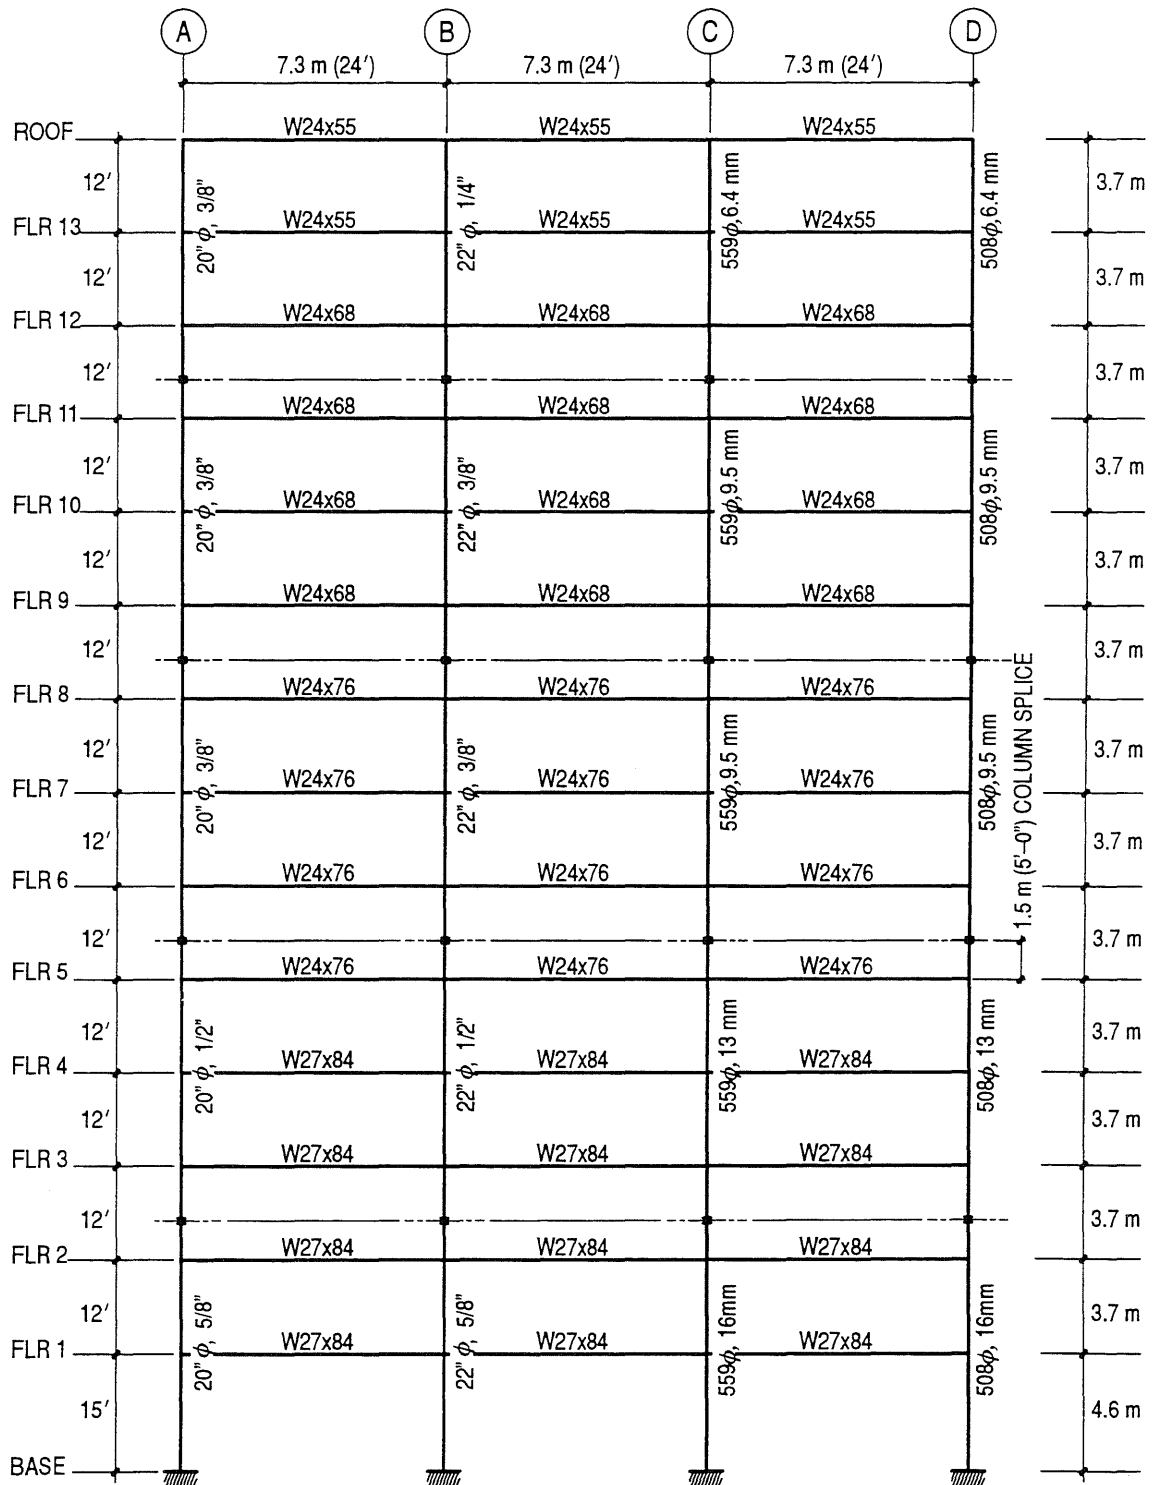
14 Story Perimeter Frame, Elevation
